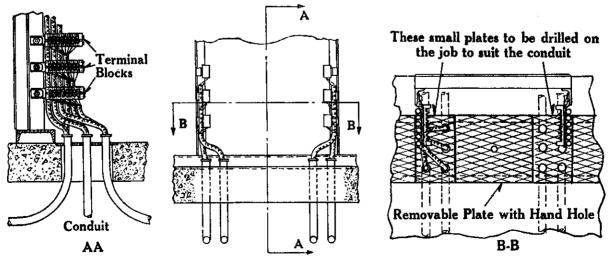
Arrangement for Terminating Conduits which Come to Switchboard Through Opening in the Floor. Conduit Ends Supported in Place by Stationary Iron Plates, Switchboard Mounted on Angle Iron Frame.
